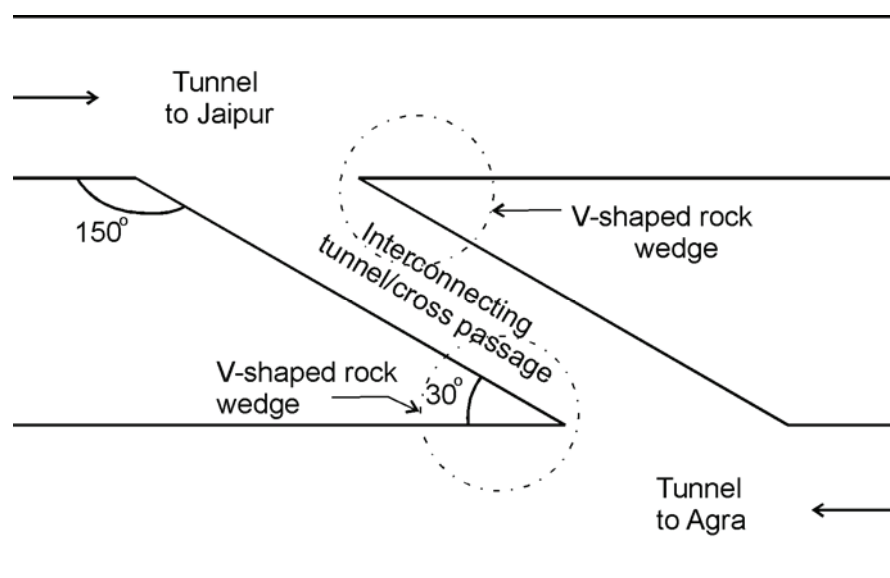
Layout showing interconnecting cross passage at an angle of 150° to main tunnel and V-shaped rock wedge for left-hand direction traffic (LHT) movement
